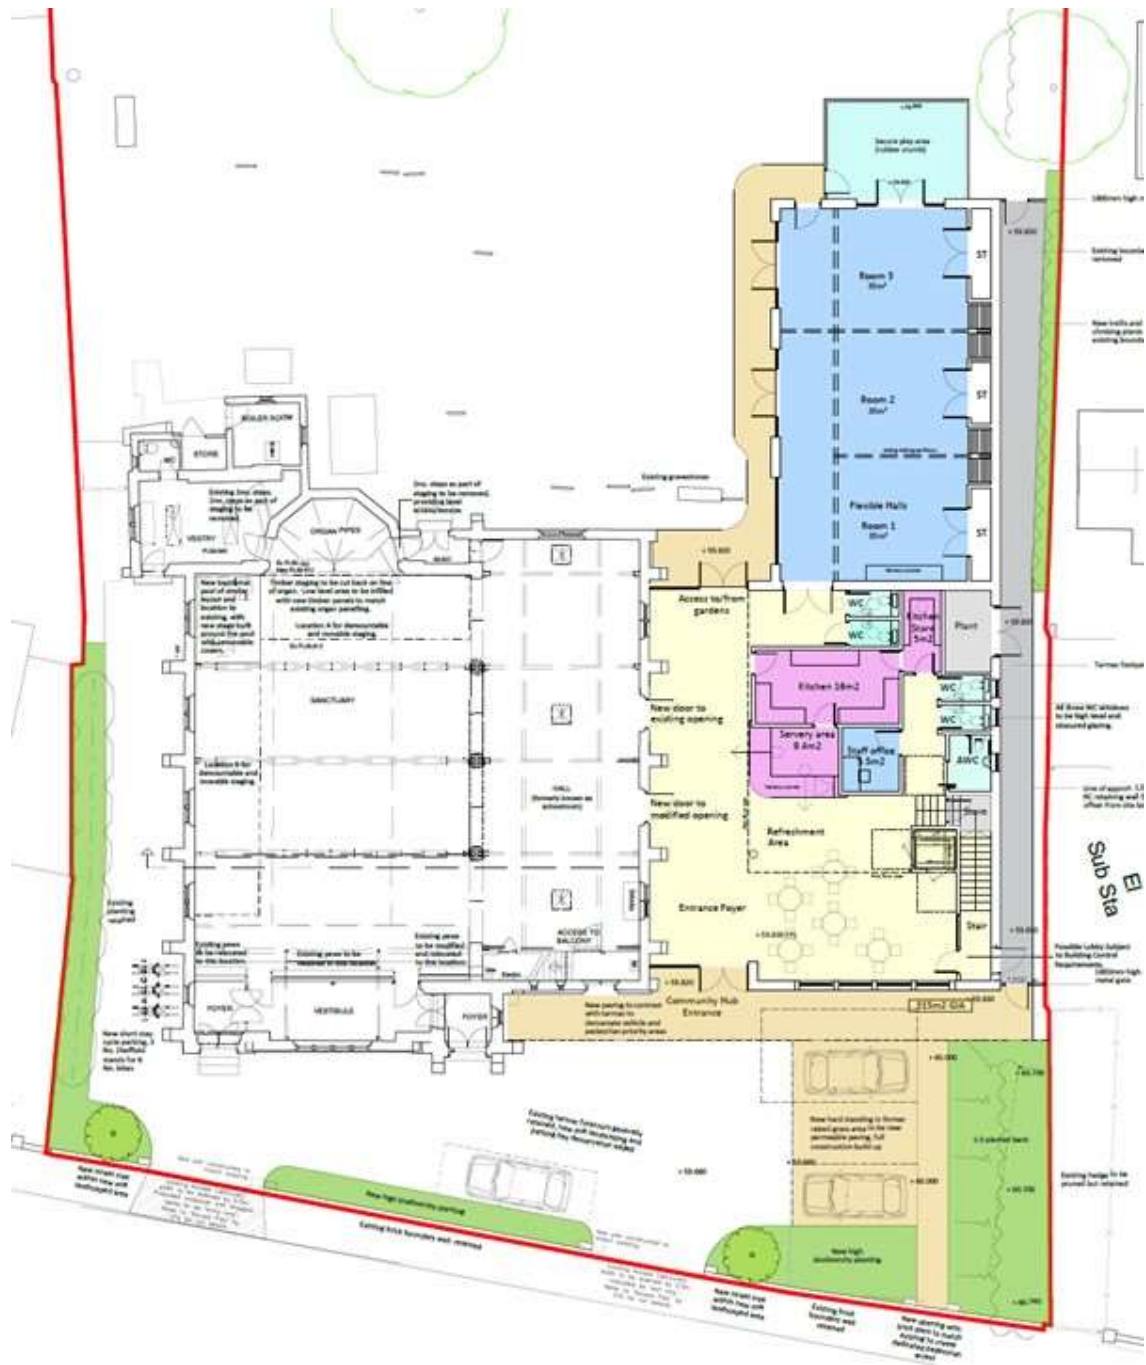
Proposed ground floor plan of SEC Church with new annex.
